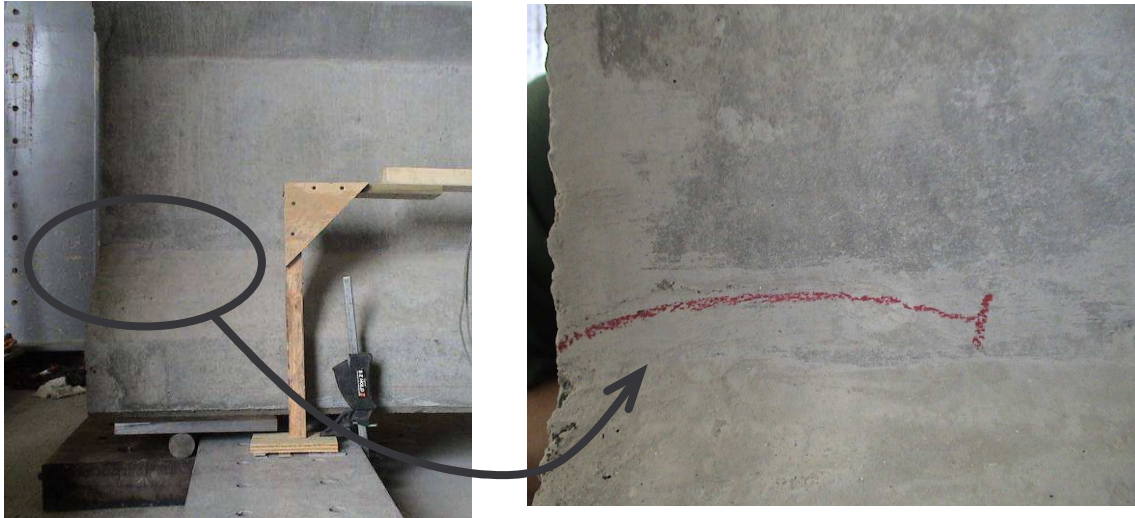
Initial Cracking in the Web of the Girder Ends
